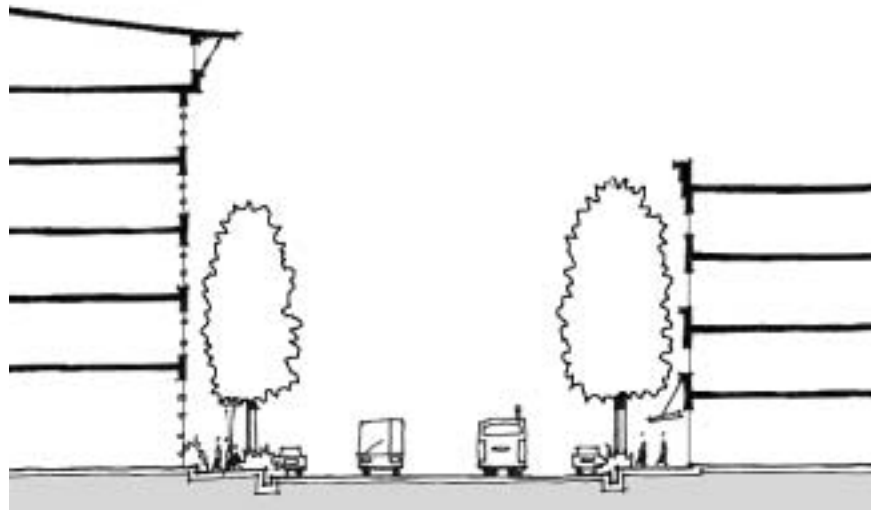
Section: 90' Right of Way. Wide sidewalks, large shade trees, 1 travel and 1 curb parking/loading lane each way.
